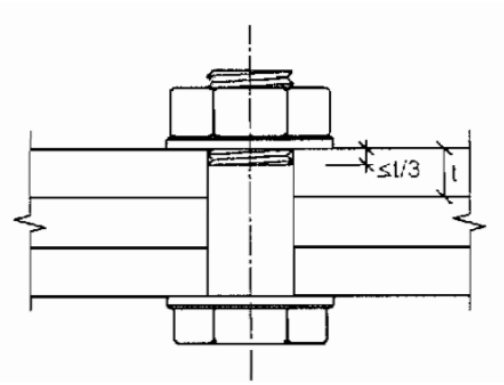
Length of bearing part of the threaded portion. [14, Ch. 3.6.1]
